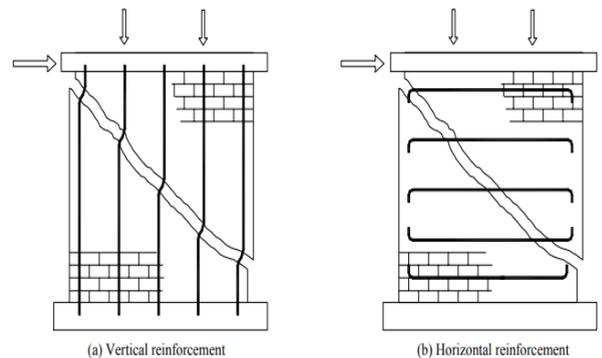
Role of reinforcement in resisting masonry shears Failure.
